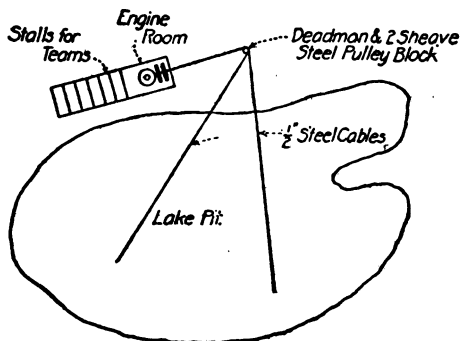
Sketch Showing Manner of Loading Scrapers Using Hoisting Engine and Cable.
